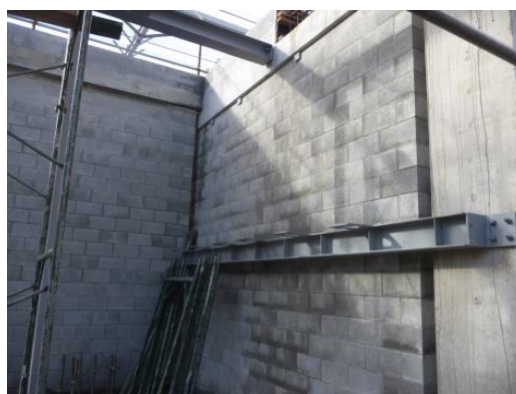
The wall is separated from the adjacent column. The connection between the steel beam and the wall at the left-hand end of the beam needs to allow for relative movement between column and wall.
